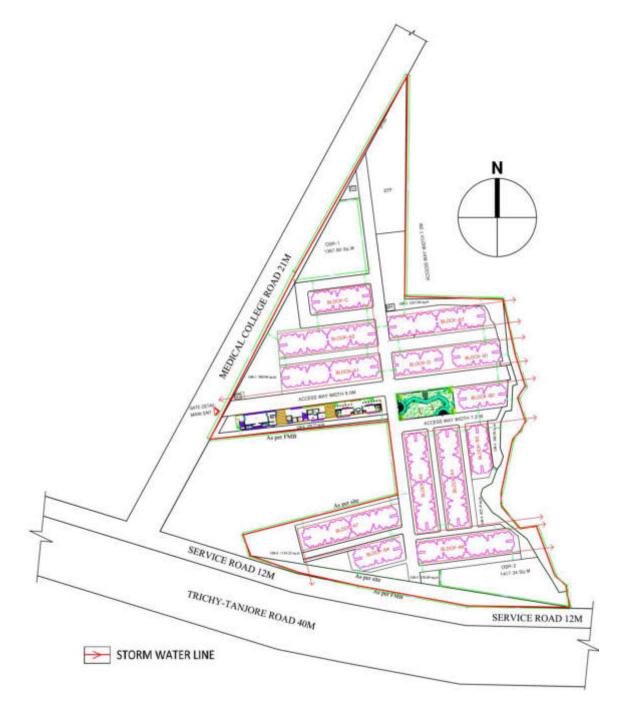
Proposed Master Plan of Vallam Resettlement Site
